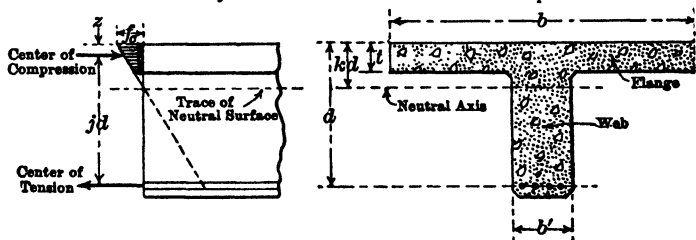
Stress Diagram and Cross-Section of a Reinforced-Concrete T Beam
